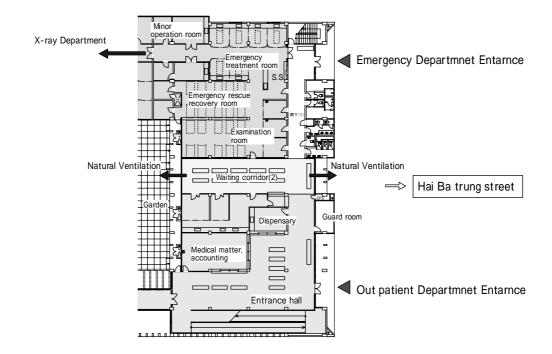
Building for Outpatient Department and Emergency Department, 1st Floor
